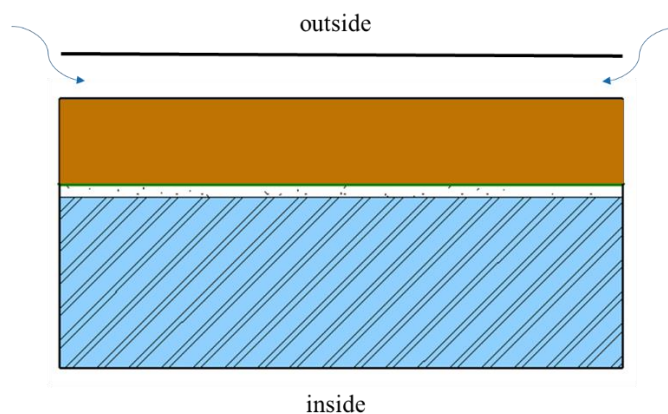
Wall composition after thermal retrofit (Alternative 2). From inside to outside: masonry brick, plaster, straw panel, rear ventilated façade
